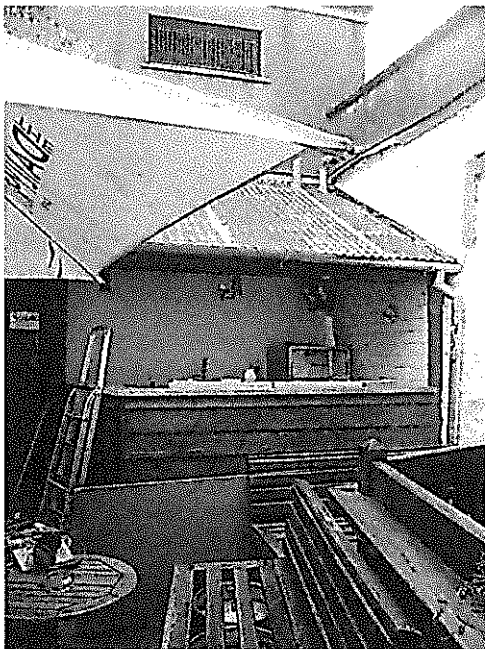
Existing beer garden to the rear of No. 53. New service kitchen for sale of pizzas under construction.
